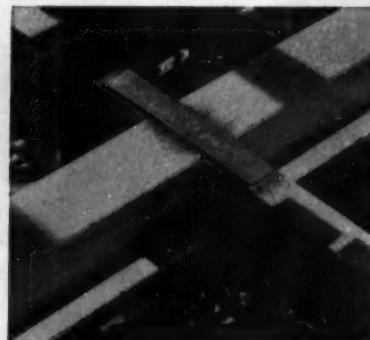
Top flanges of filler beams are connected by strap plates over the girder, while lower flanges are butt welded to the web on both sides. Wide flange structurals are used throughout.
